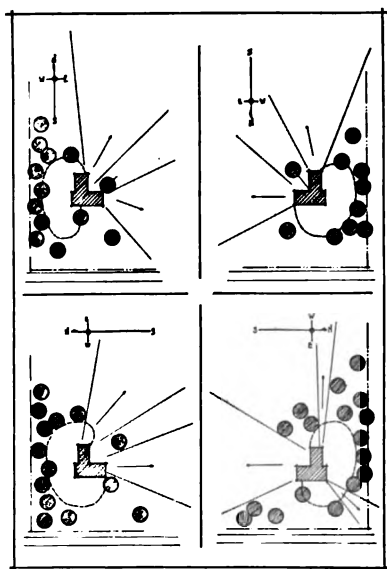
Plans for tree arrangement to afford protection from north winds on lots of different orientation
